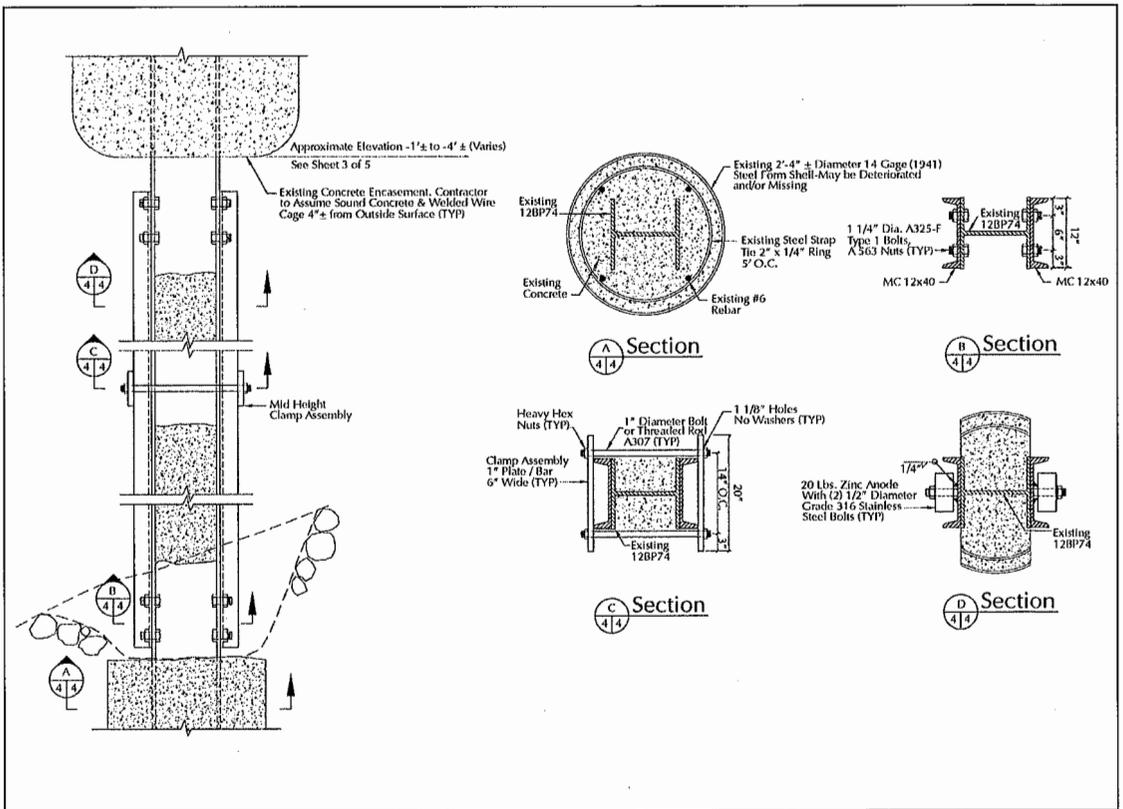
Steel pile repair detail (from a 1997 archive drawing).
